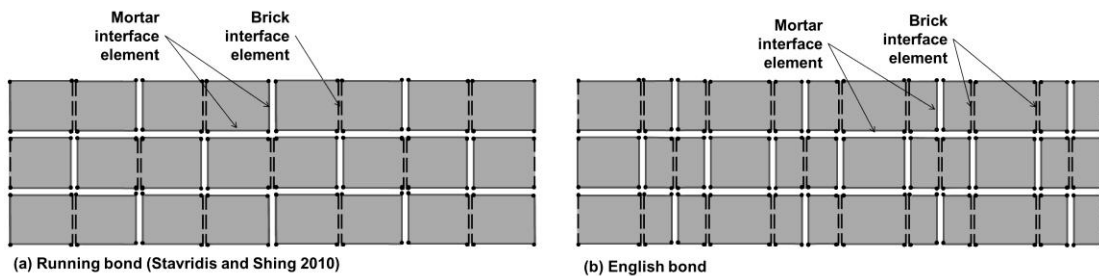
Assembly of smeared crack and interface elements to model masonry
